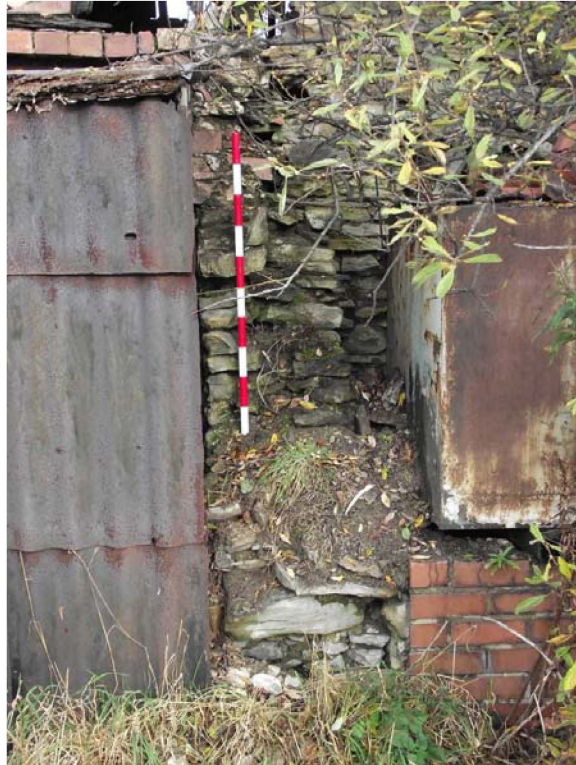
South, west and north ranges, enclosed area, looking north (2m scale)
